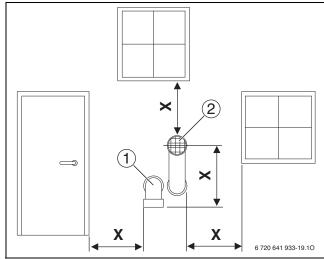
Vent and combustion air pipe position of a sealed combustion system
